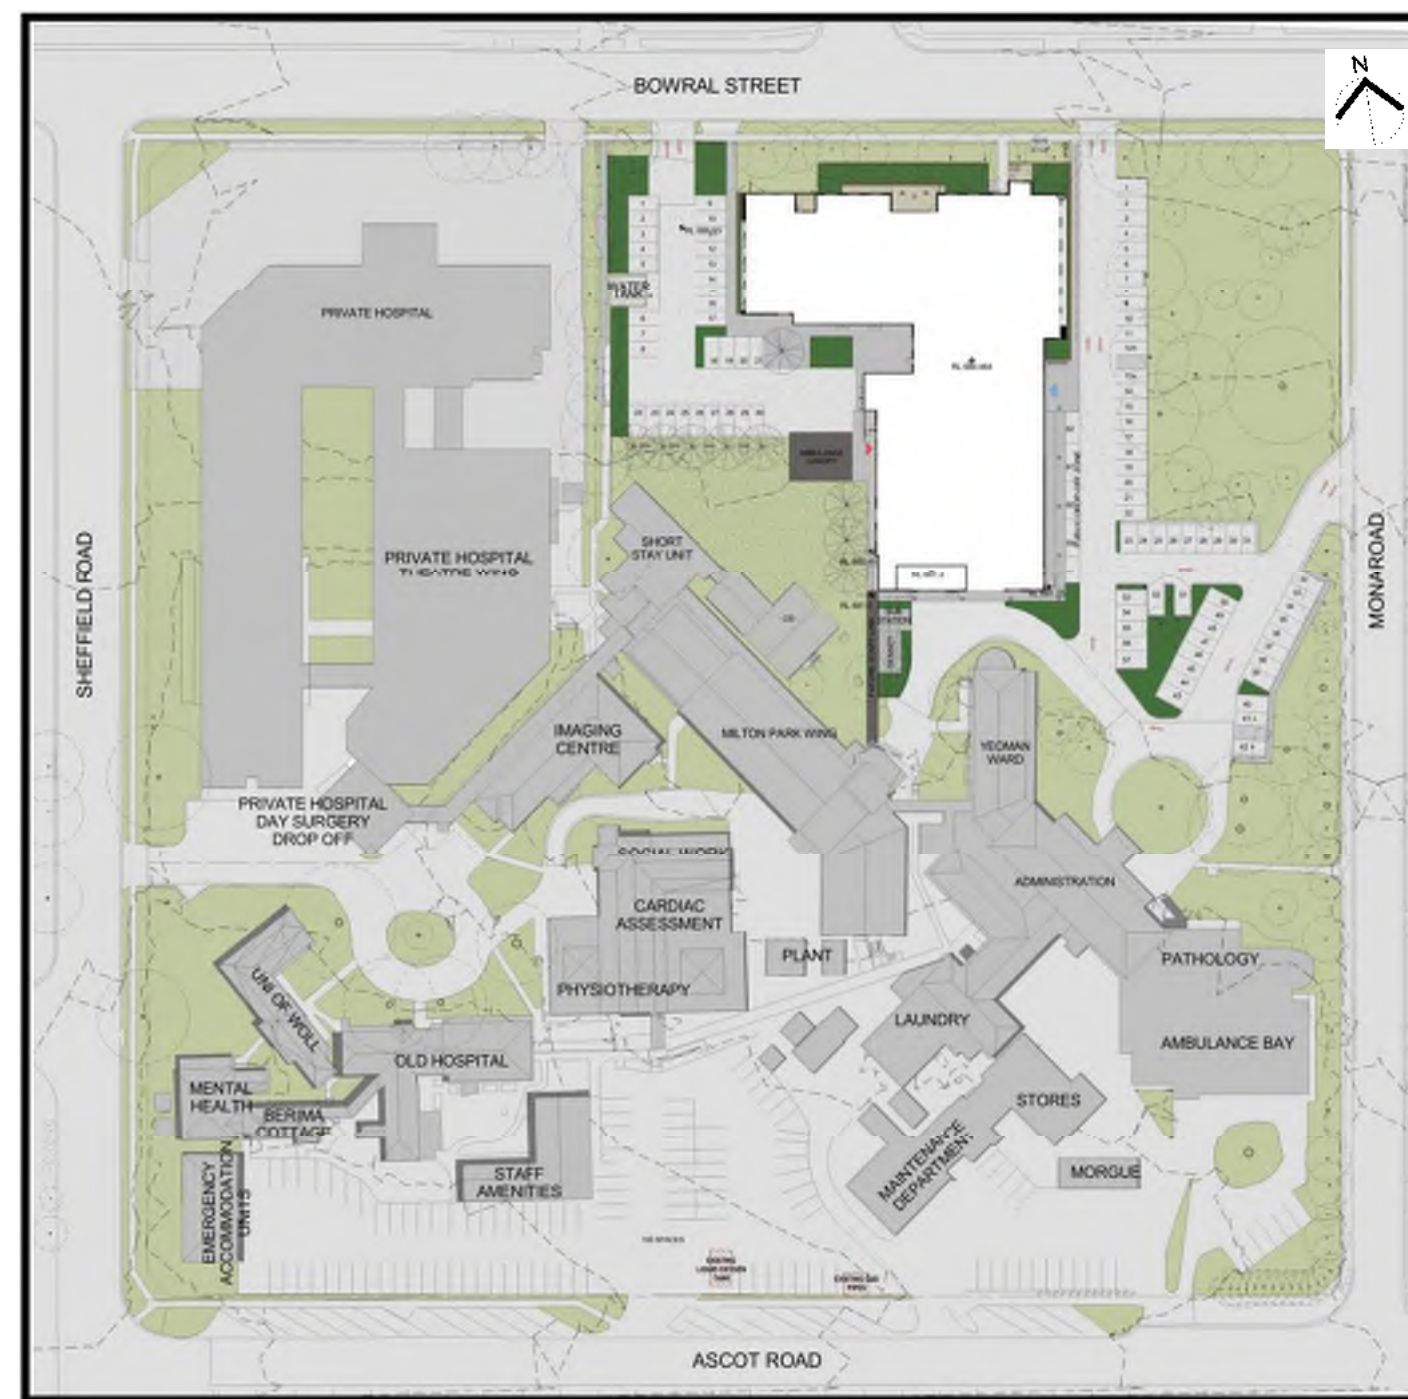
Proposed Location of New Building (Source: MSJ Architects)
